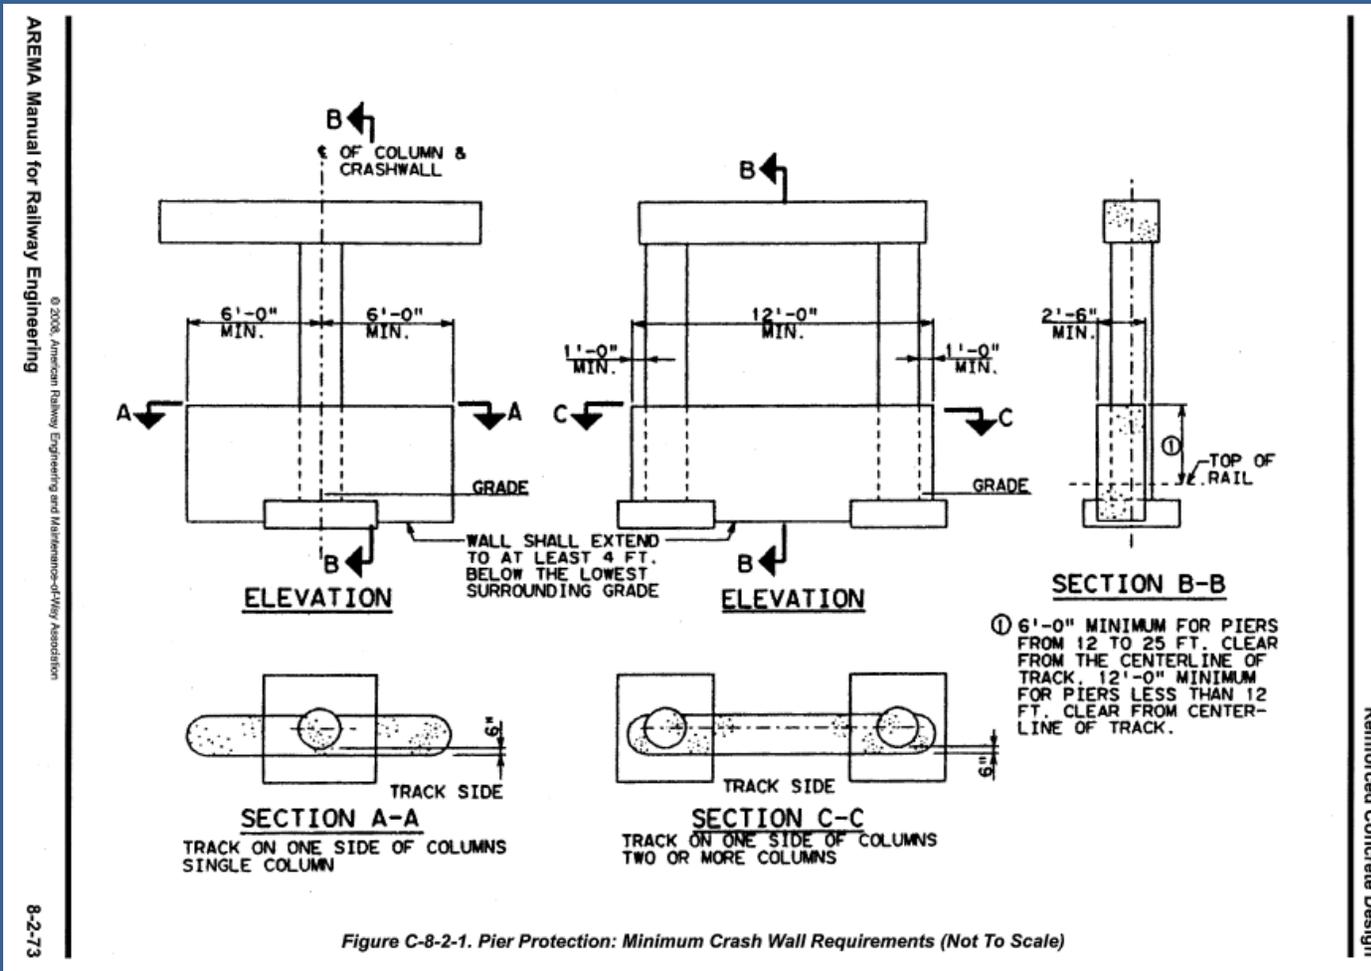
Pier Protection: Minimum Crash Wall Requirements (Not To Scale)
